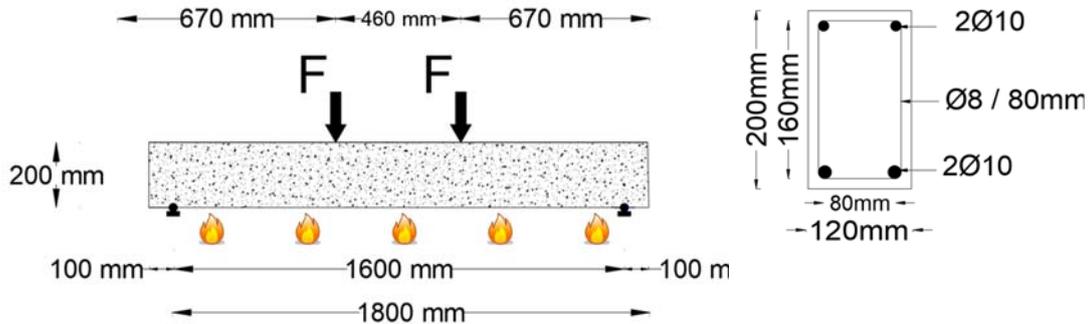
Considered beam with its geometry, cross-section and loading conditions
